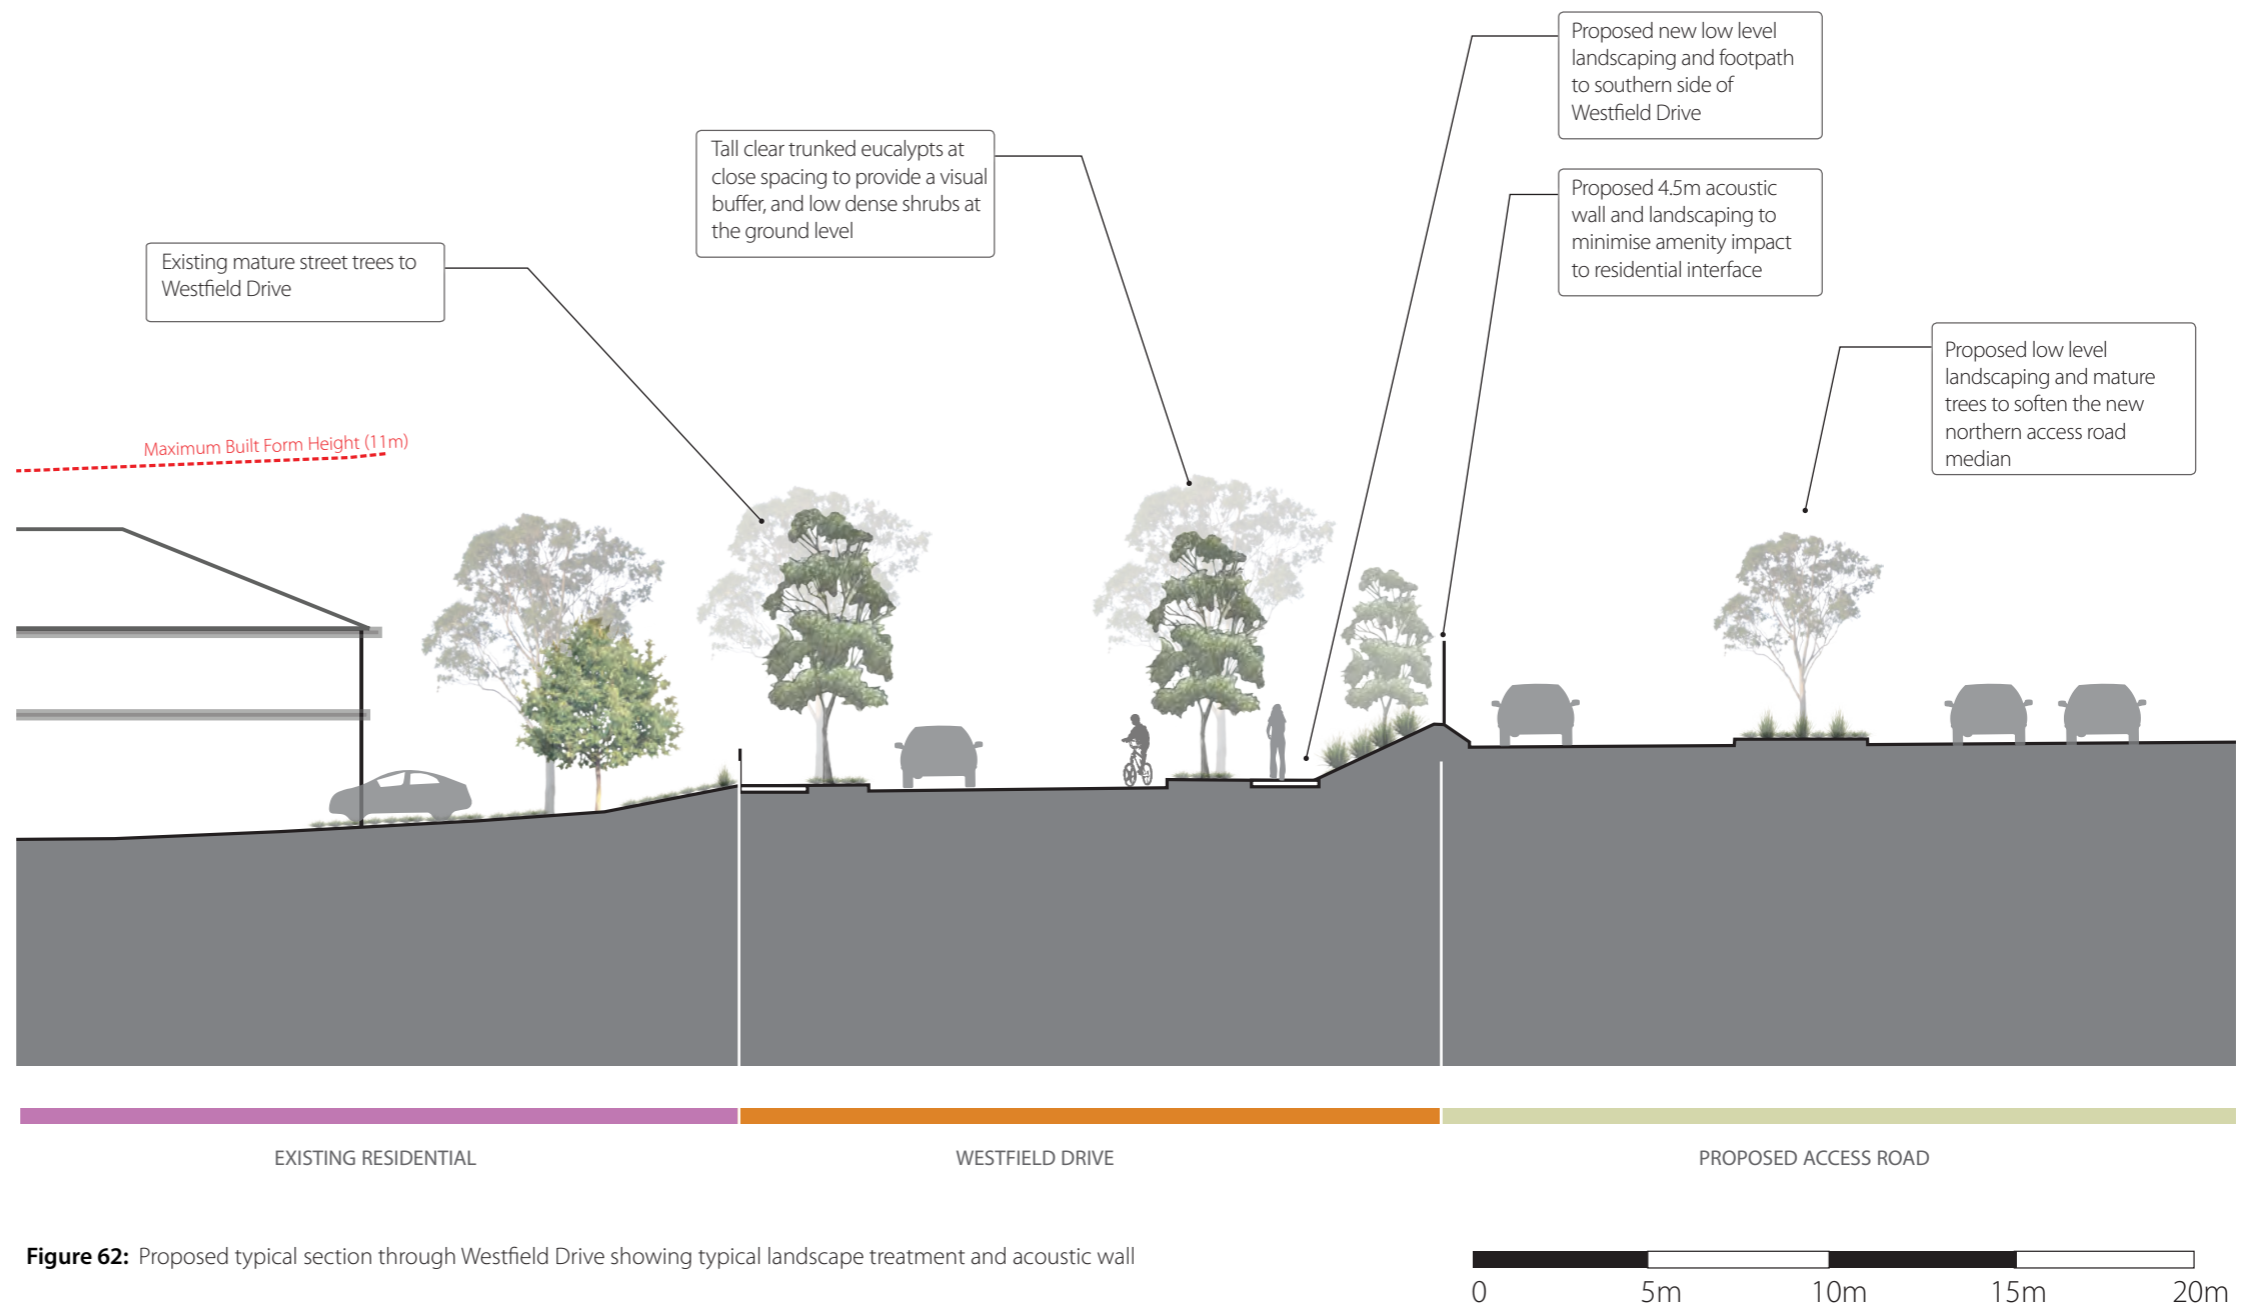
Proposed typical section through Westfield Drive showing typical landscape treatment and acoustic wall
